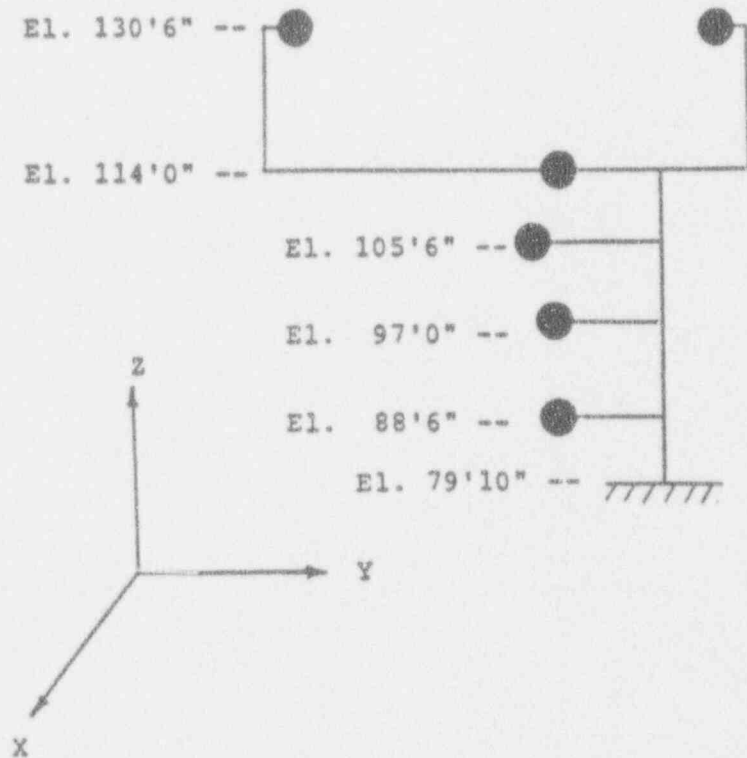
Peach Bottom Circulating Water Pump Building Structural Model
